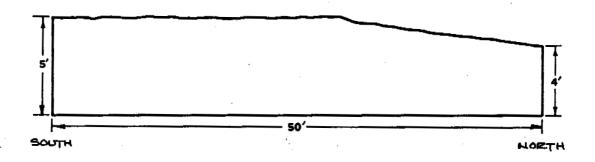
Elevation of West Outside Wall at Sand Springs Station
